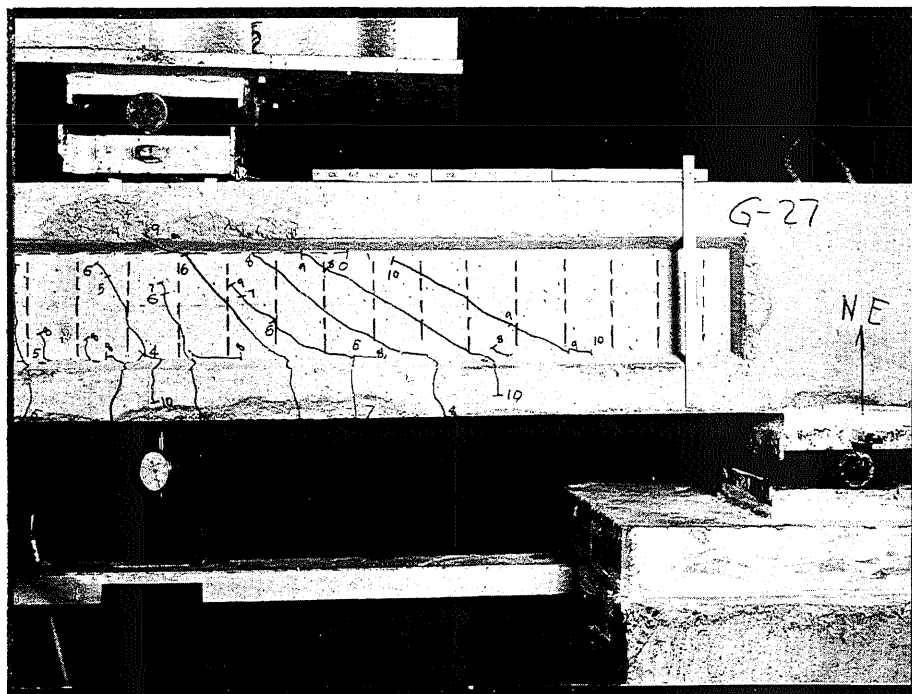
SUCCESSIVE FORMATION OF INCLINED CRACKS IN A BEAM WITH VERTICAL STIRRUPS
